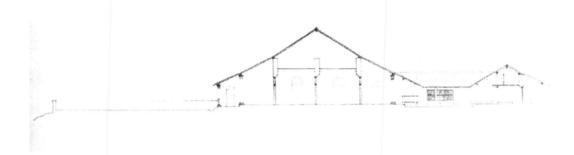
Section of Ekneligoda Walawwa. (Source: Architecture of an island, p265).
